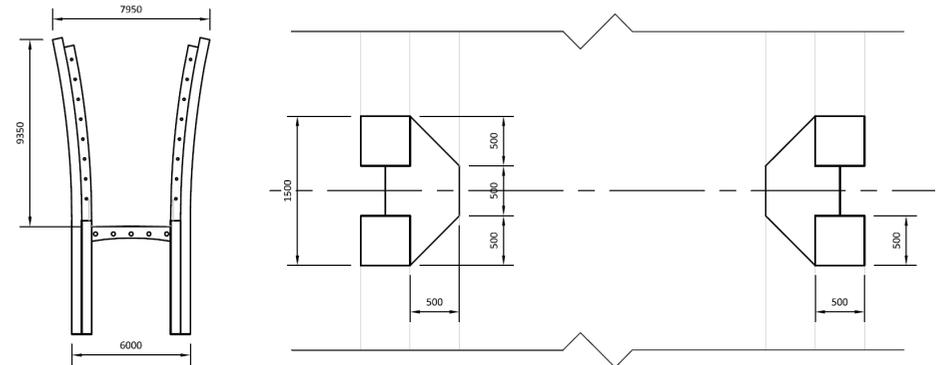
Main span pier legs. a) Elevation view of tower, b) Plan view of tower footprint at deck level.
